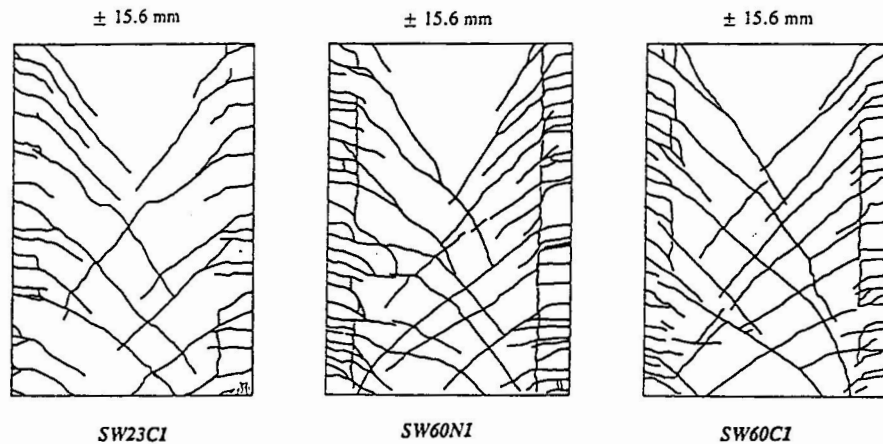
Typical crack patterns at ultimate state of walls SW23C1, SW60N1 and SW60C1
